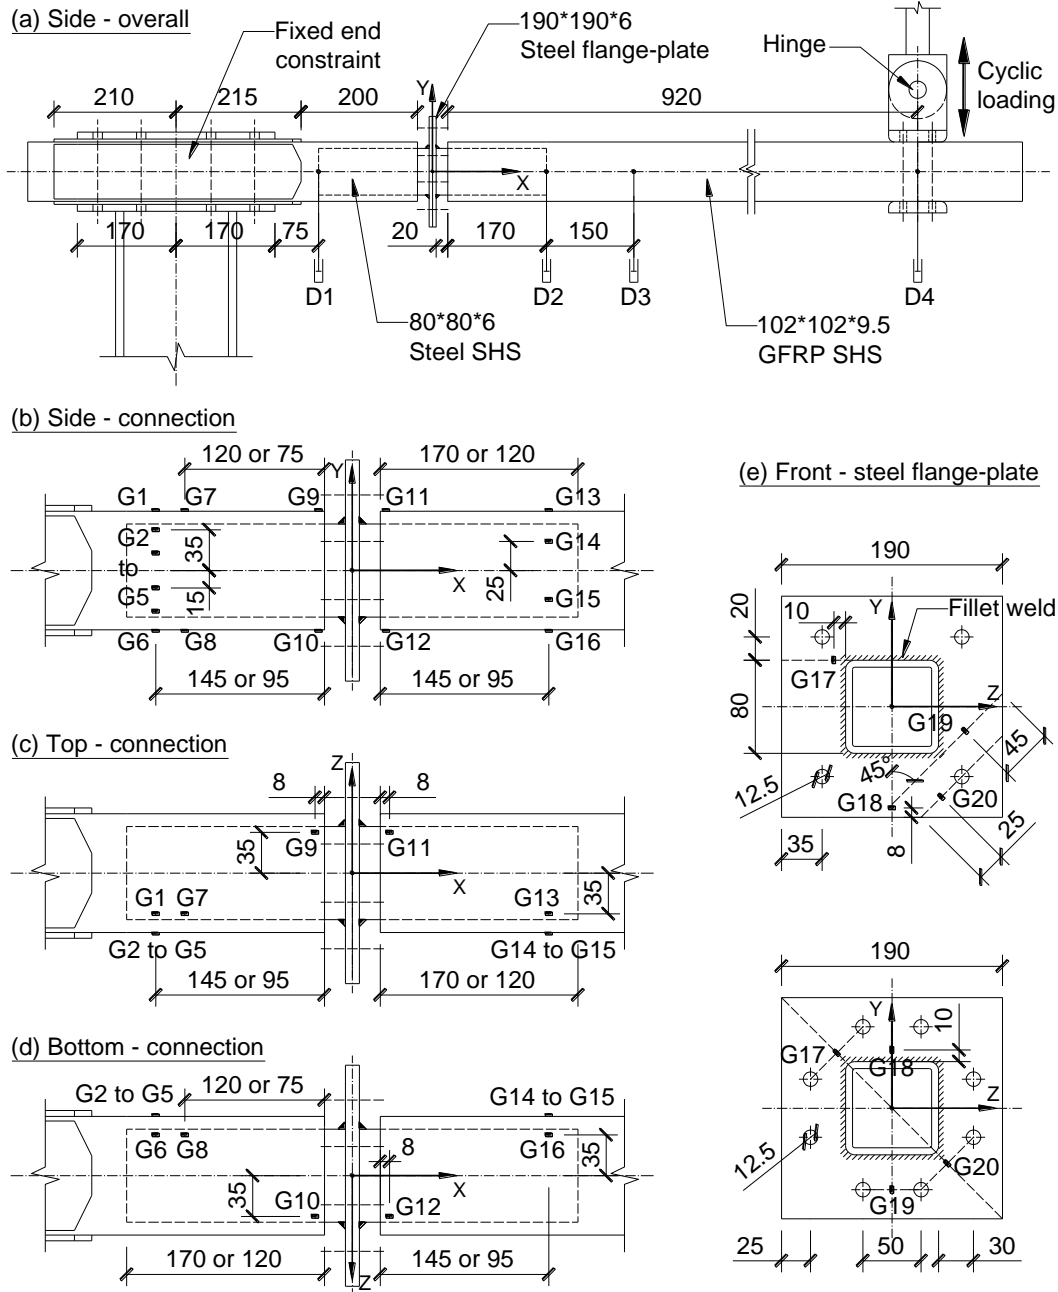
Dimensions of the splice connection specimens (all units in mm; G1 to G20: strain gauges; D1 to D4: displacement gauges): (a) overall side view; (b) side view of the connection; (c) top view of the connection; (d) bottom view of the connection; (e) front view of the flange-plates with four and eight bolts.
